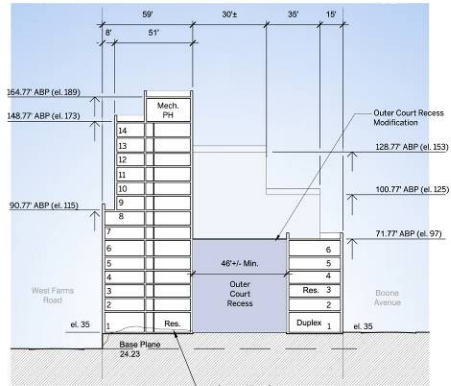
G: Buildings 1A / 1B and 2A / 2B - Proposed Outer Court Recess Waivers
